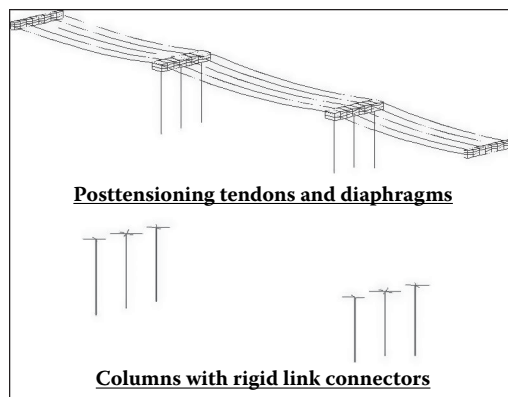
Posttensioning tendons, diaphragms, and column to diaphragm connection modeling examples.
